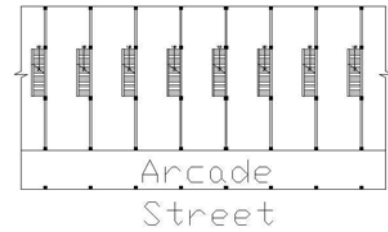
C: Typical Ground Floor Plan- Past Practice (Source: EERI 2001)
